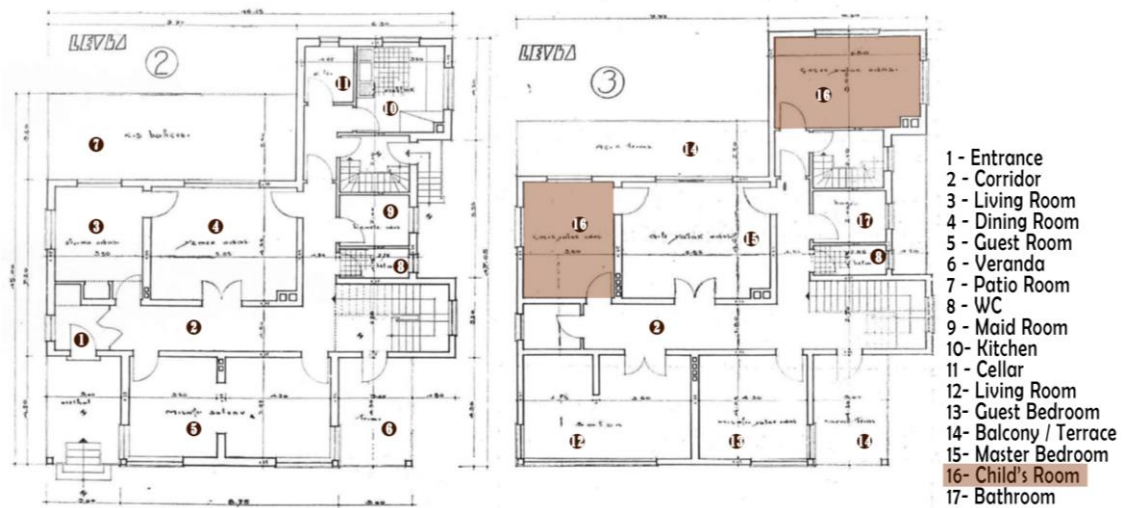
The ground and first floor plans of a house in Feneryolu, İstanbul (Arkitekt, 1936, 2)
